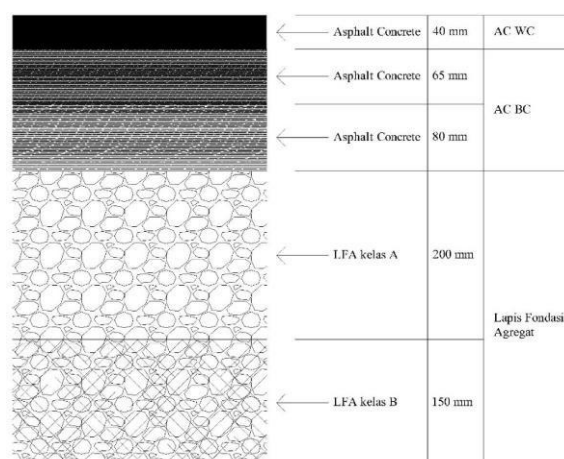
Pavement Layer (Flexural Pavement with LFA)
